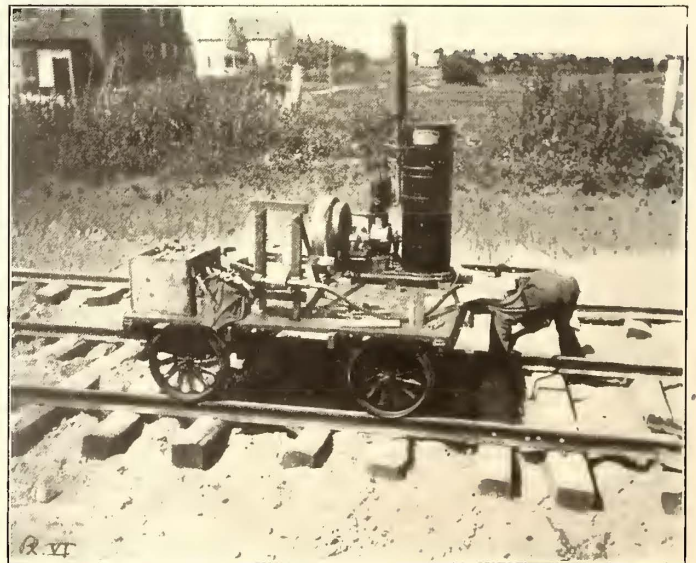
PORTABLE GRINDING EQUIPMENT FOR BRIGHTENING CONTACT POINTS
